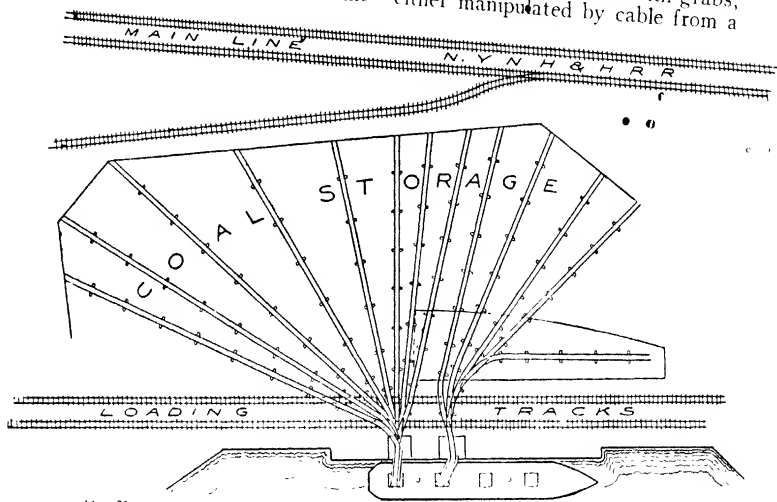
PLAN OF THIRTEEN HUNT AUTOMATIC RAILWAYS, FROM TWO HOISTING TOWERS, NEW YORK, NEW HAVEN AND HARTFORD R. R. CO.'S LOCOMOTIVE COALING STATION AT NEW HAVEN, CONN., U.S.A.
